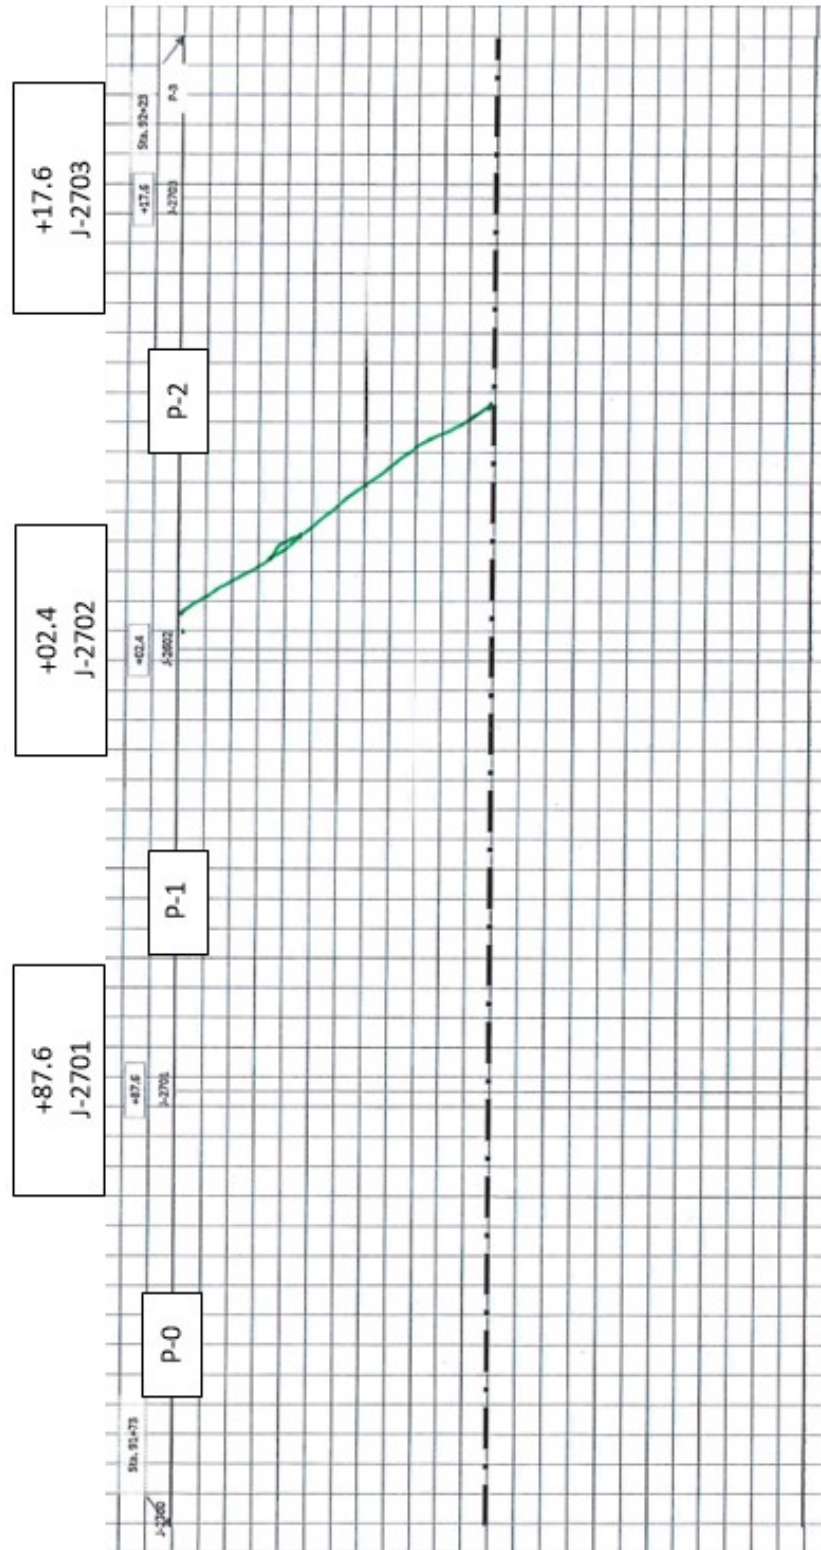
Schematic plan view of the cracking occurred on inside lane at cell 138
